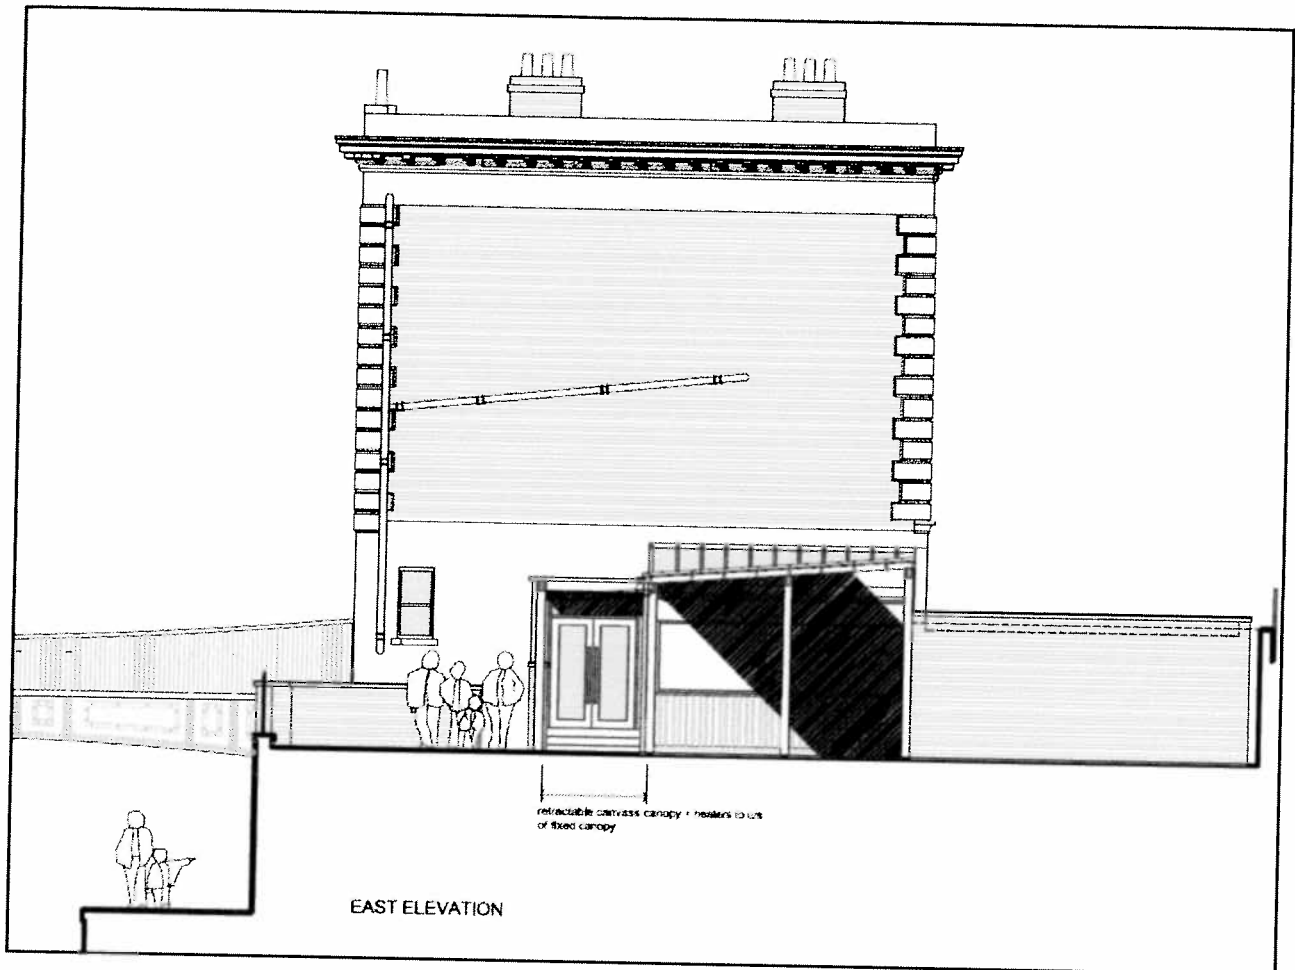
proposed rear elevation showing small retractable canopy and fixed canopy
